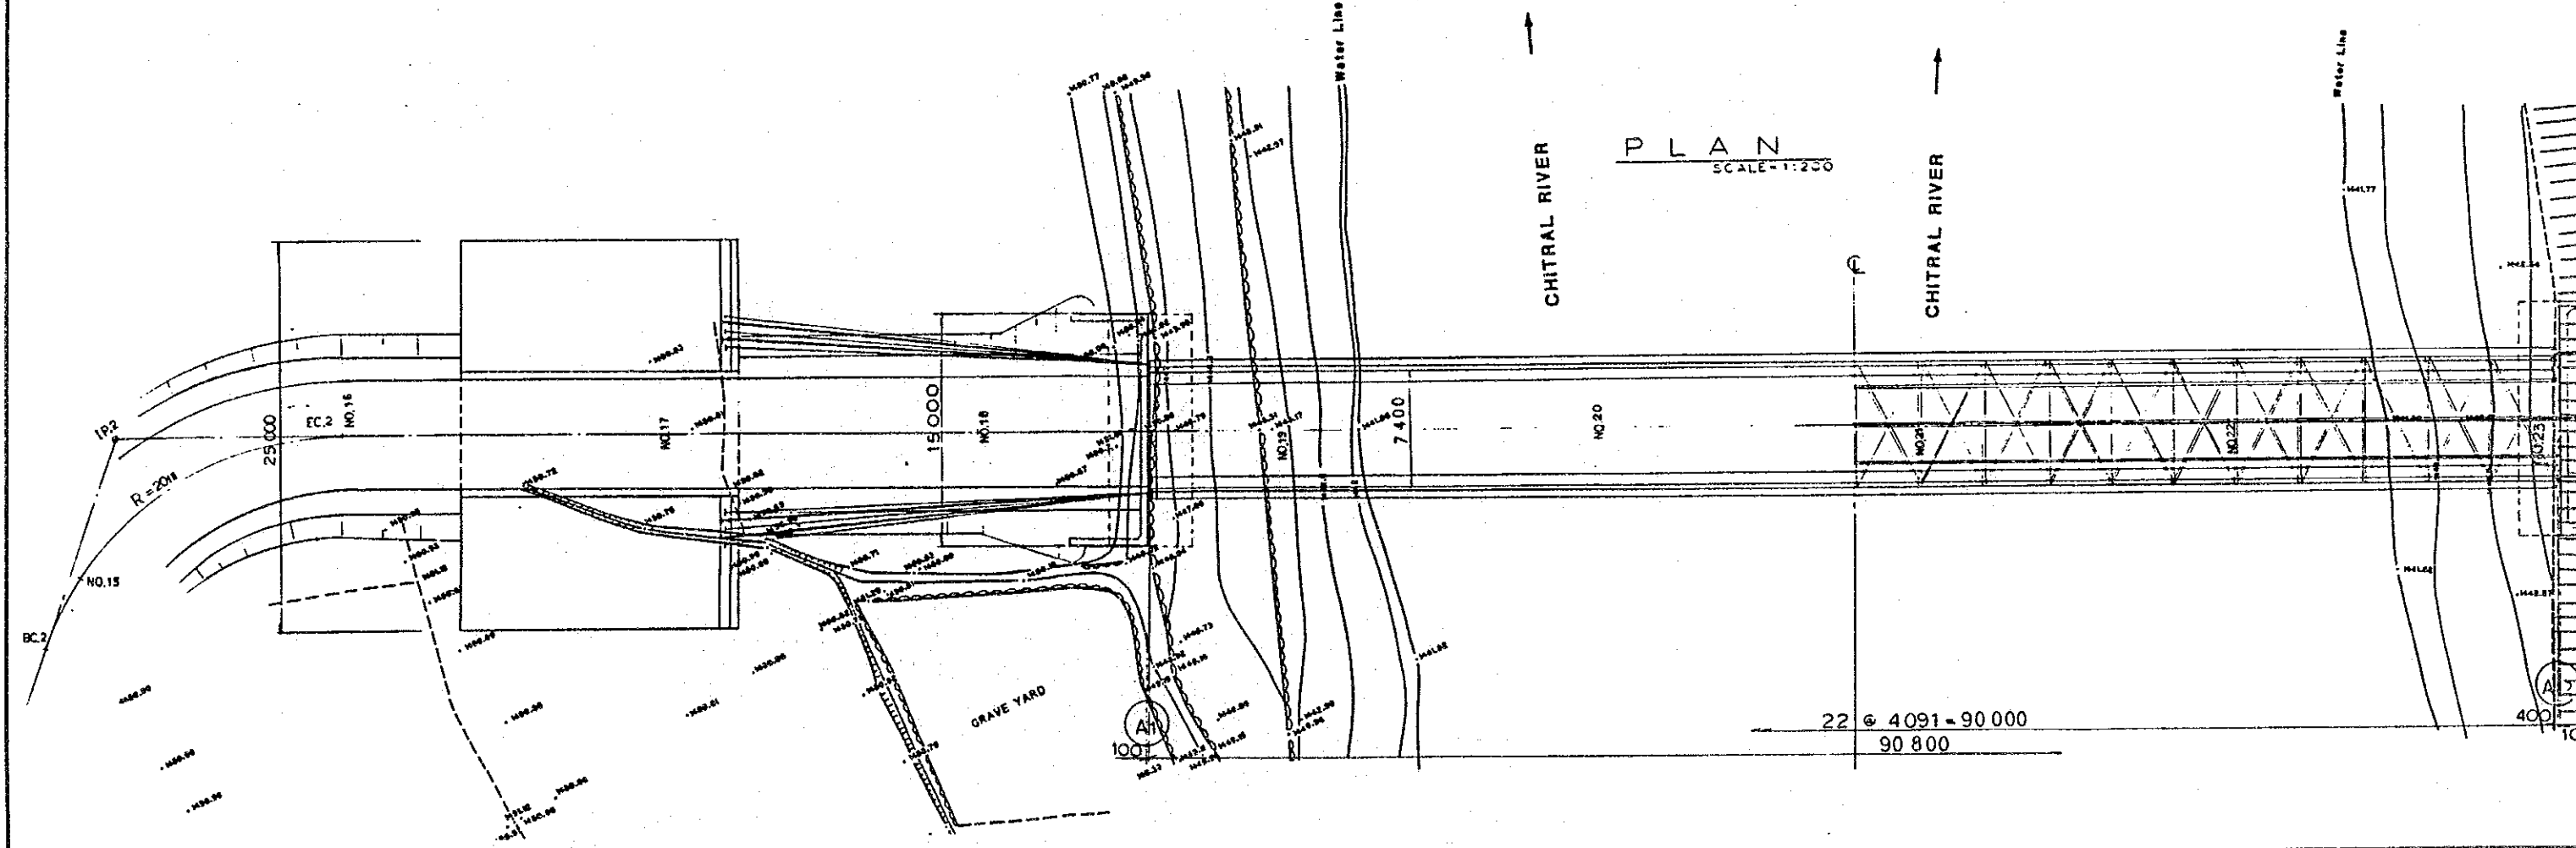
(a) General Layout Plan of the No.11 Choni Bridge (1/2)
